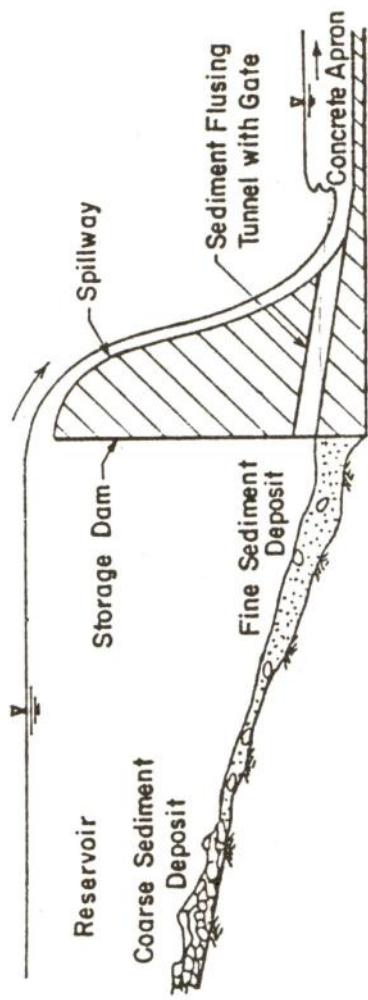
Storage Dam and Reservoir with Spillway and Sediment Flushing Tunnel for Flood Control Downstream of Foothills
